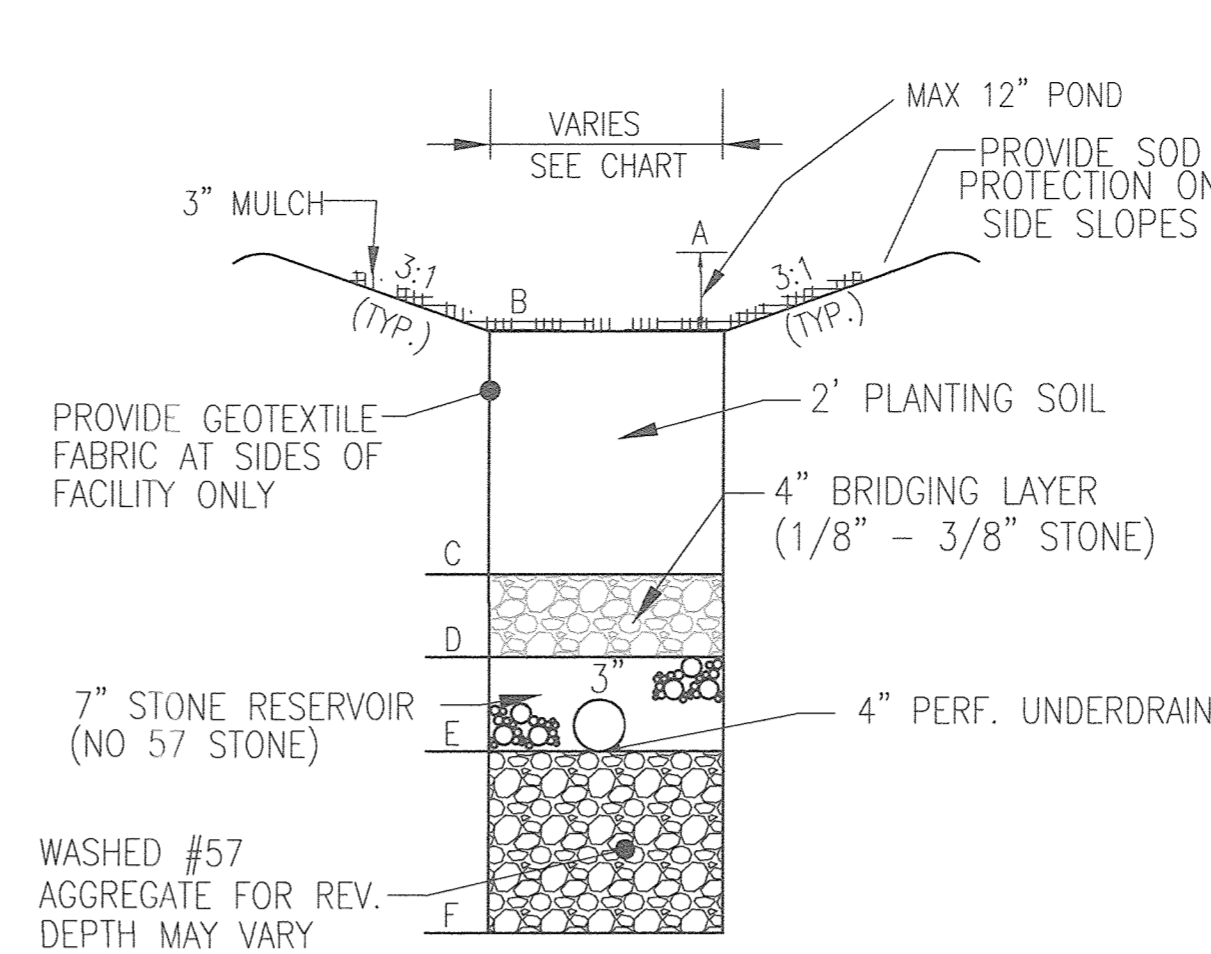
DETAILED BIO-SWALE#2 AND PLANTING PLAN
